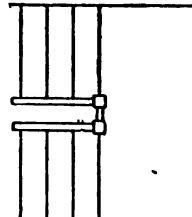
Partial Plan of Stairs, Showing Full Platform.
